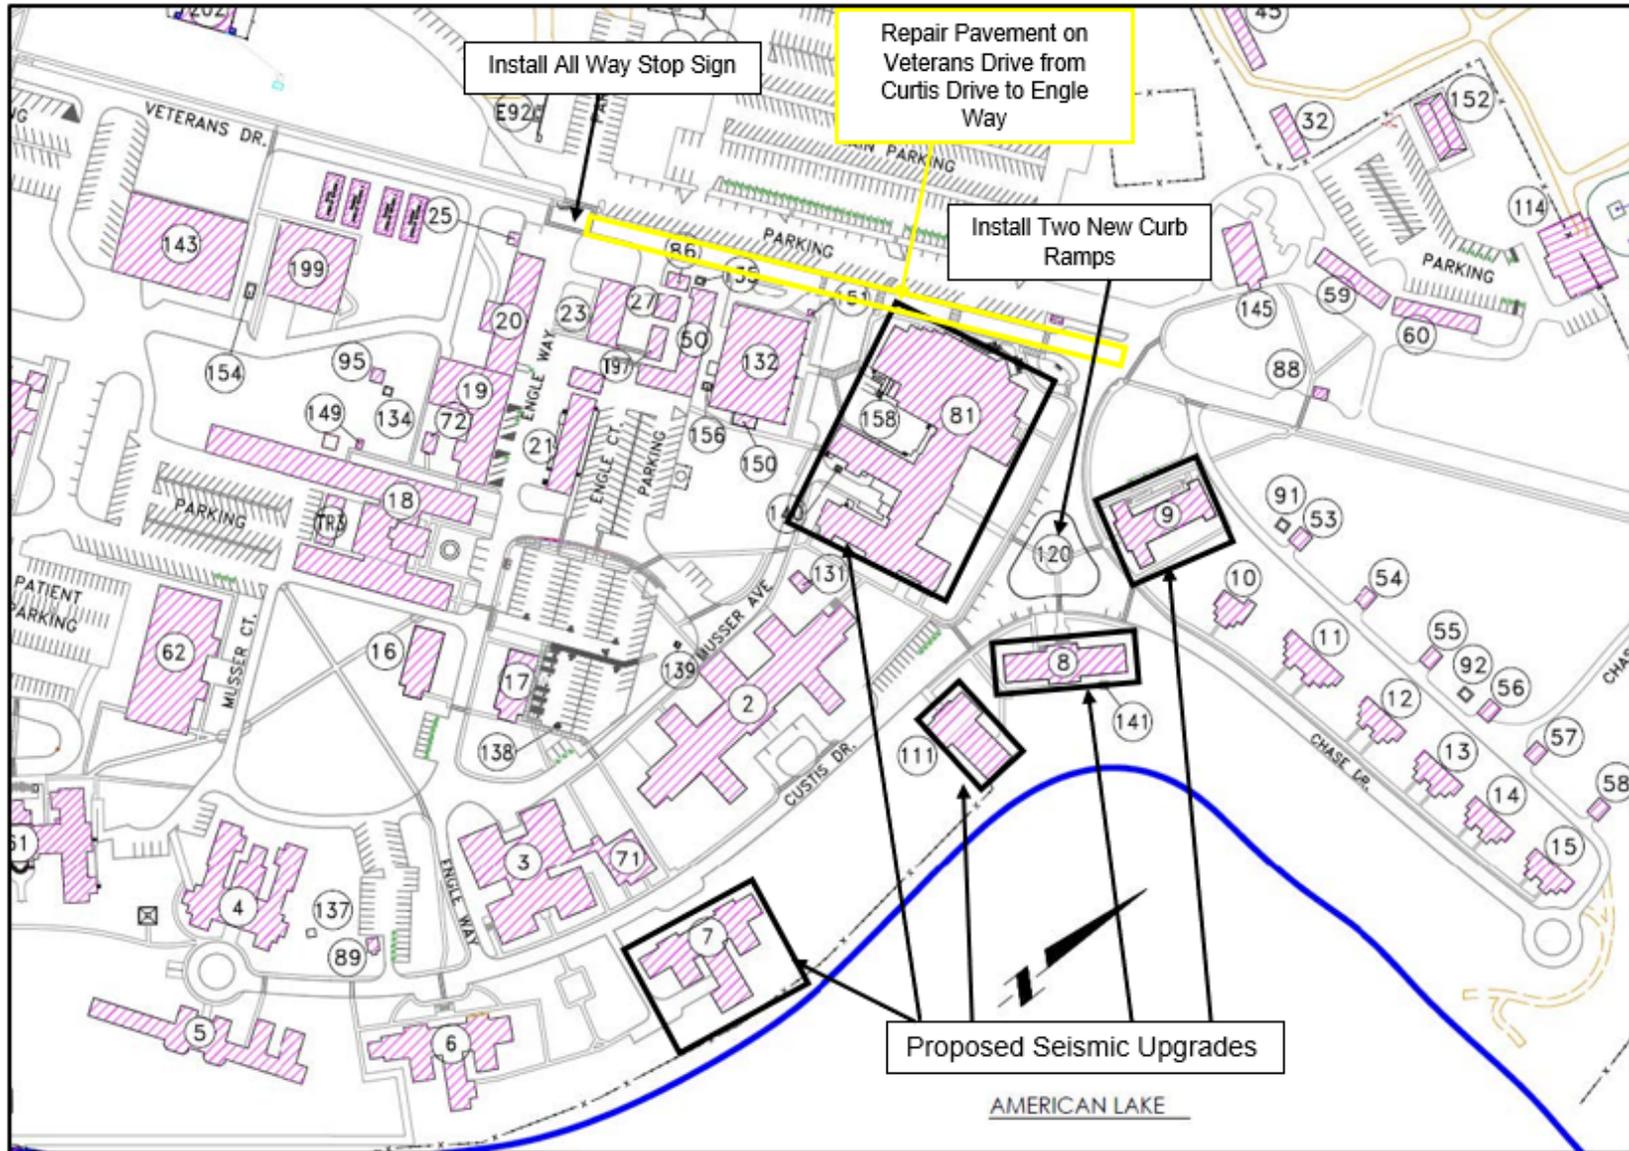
Location of Proposed Seismic Upgrades and Renovations
